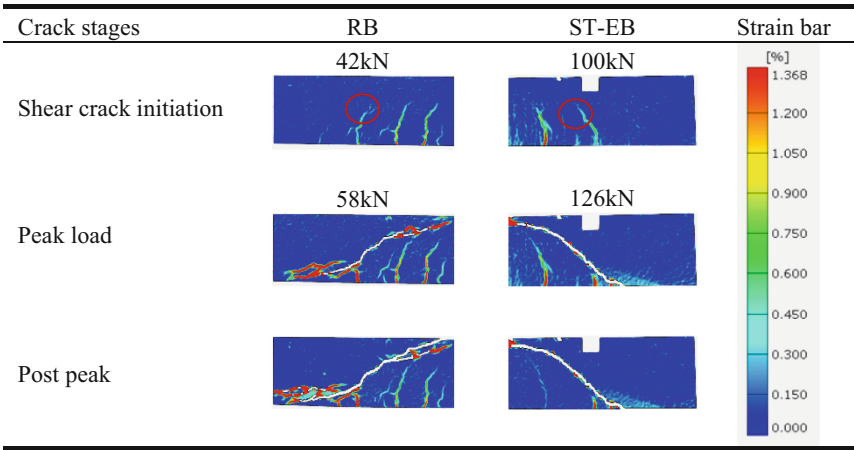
Damage process of test beams (left RB, right ST-EB).
